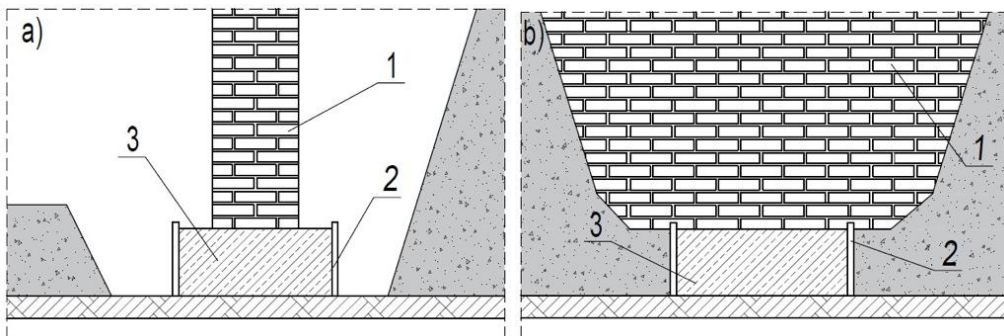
Method of strengthening existing foundations: a) cross-section, b) longitudinal section, 1 – existing foundation wall, 2 – formwork of the concreted section of the foundation, 3 – section of the new foundation
